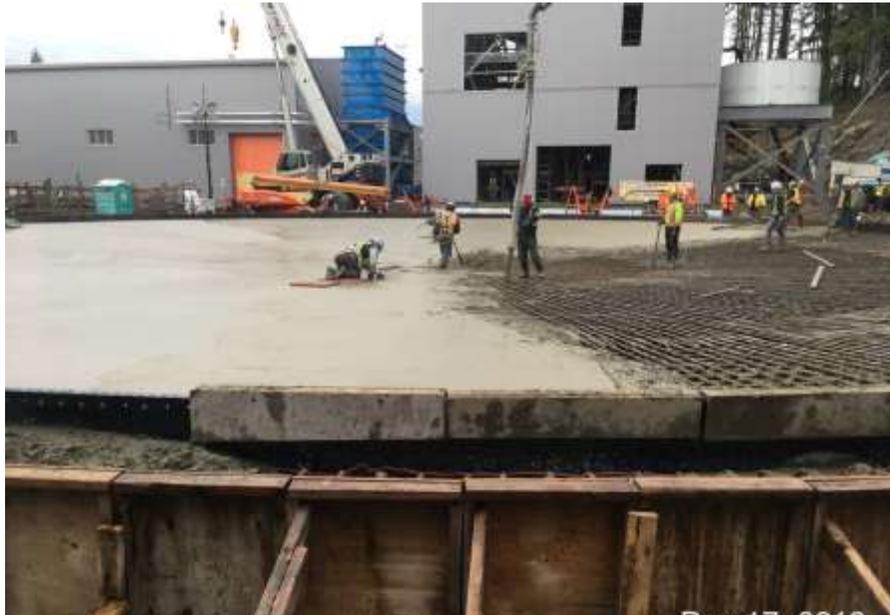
Residuals Treatment Facility- Concrete placement for digester #3 tank slab.
